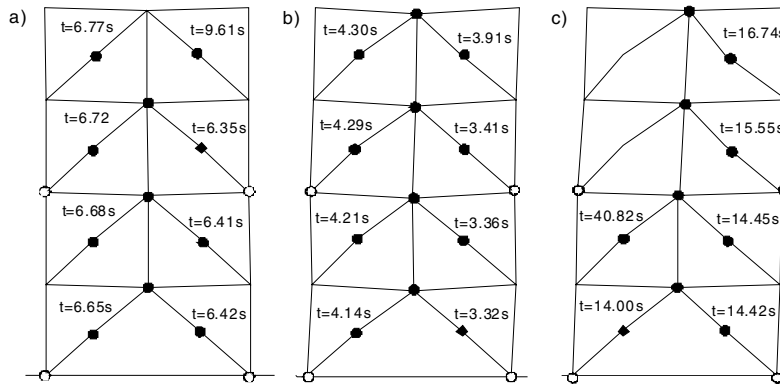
Sequence of brace buckling and beam hinging for the 4-storey building under:
